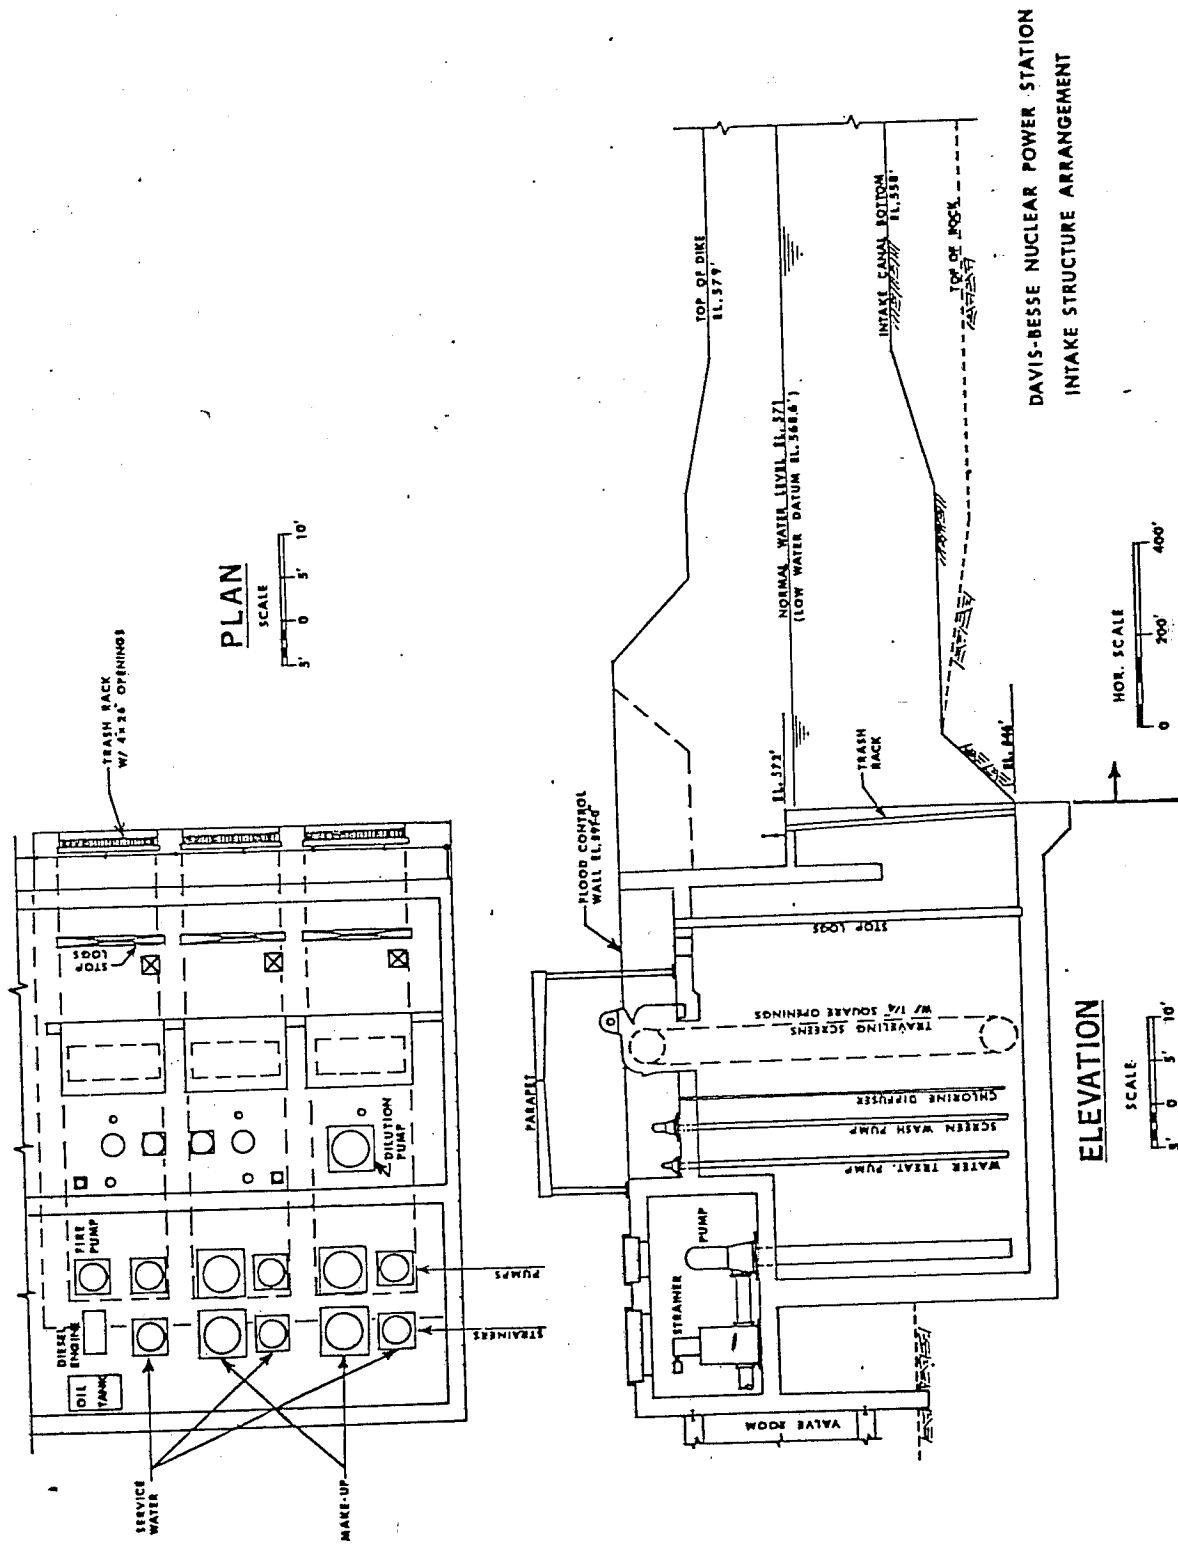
WATER INTAKE PUMPS AND SCREENS ARRANGEMENT
